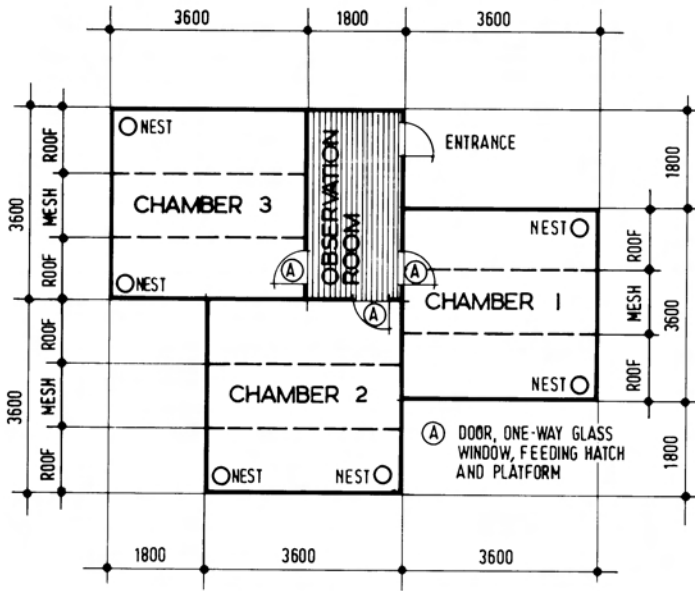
Plan of First Breeding Unit. Scale 1:100
